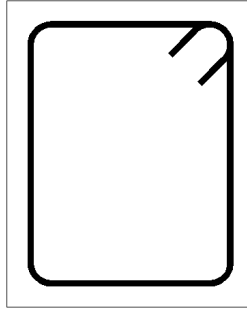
4 Stirrup Bar Arrangement Dialog
